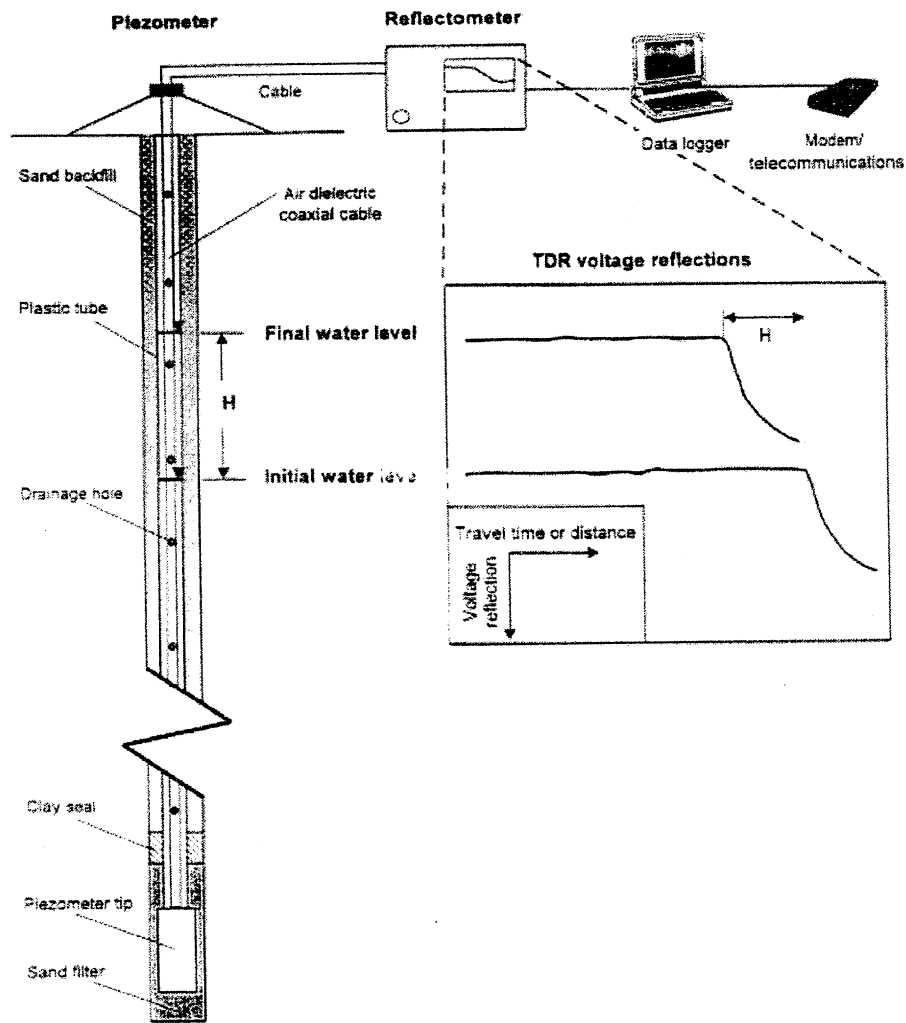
TDR monitoring of piezometric water elevations (Dowding, et al., 1996).
